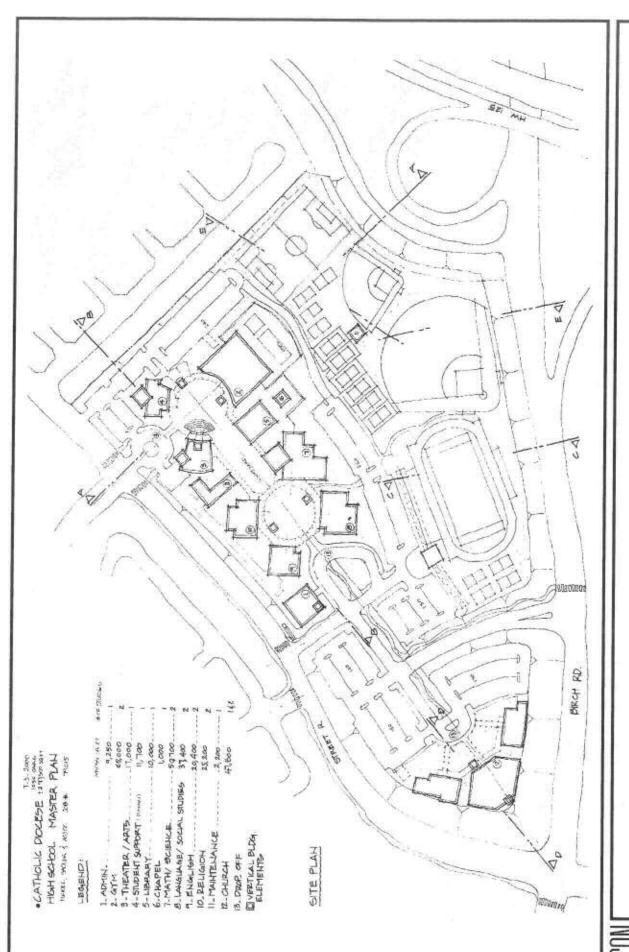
Proposed Church and Private High School Conceptual Site Plan Village Six Otay Ranch Developm Plan
